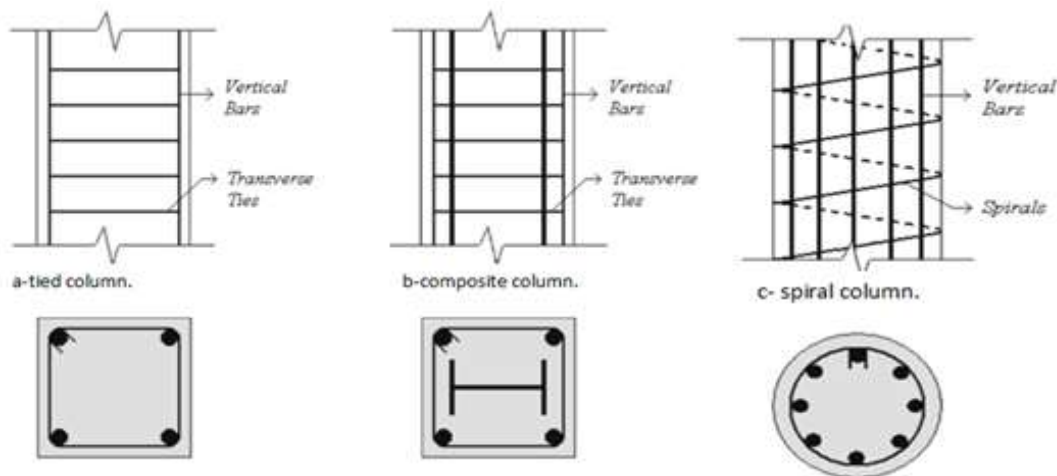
Types of column according to its reinforcement (Ibrahim et. al., 2011).
